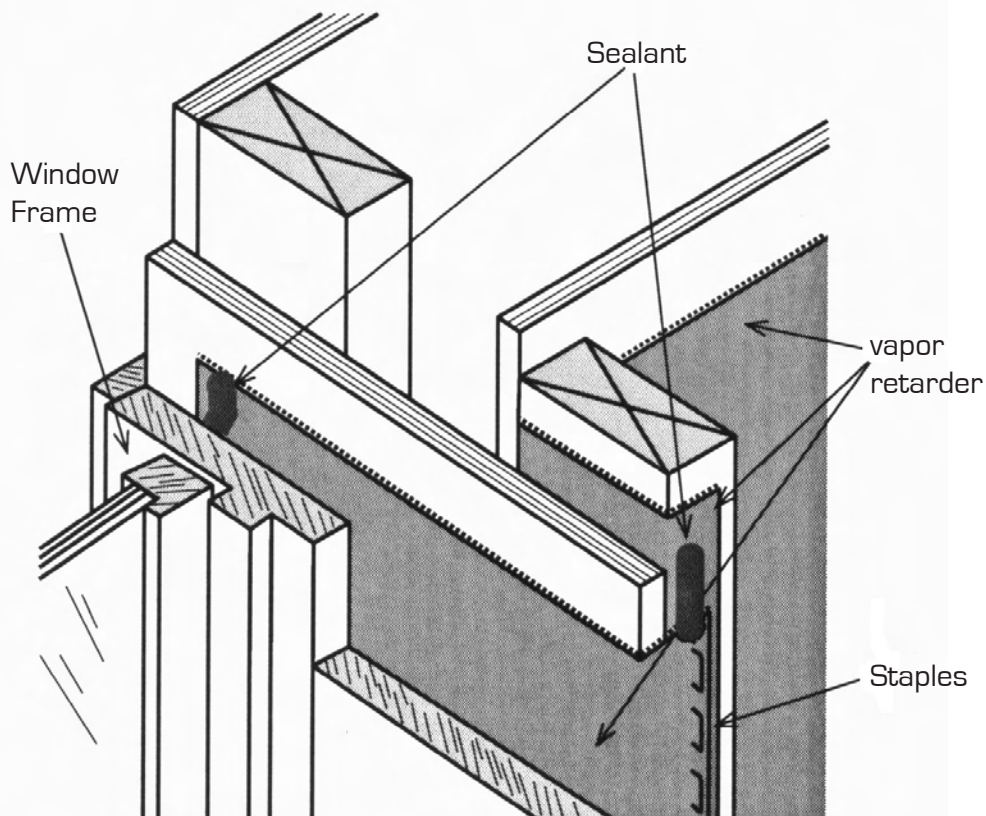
Vapor barrier sealed in Saskatchewan type double wall
